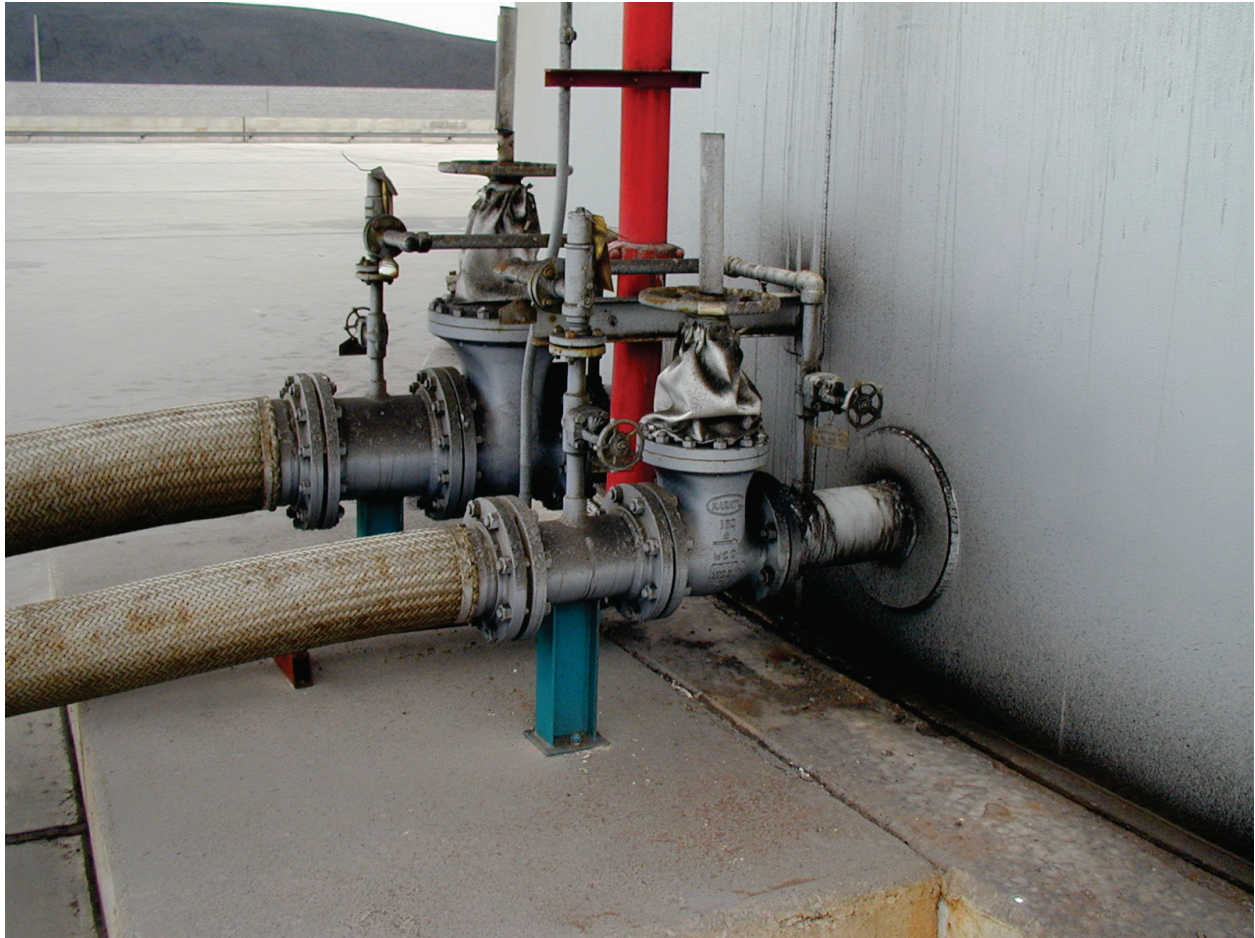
Flexible connections prevented piping damage in 2001 Peru Earthquake (Photo courtesy of Eduardo Fierro, BFP Engineers).
